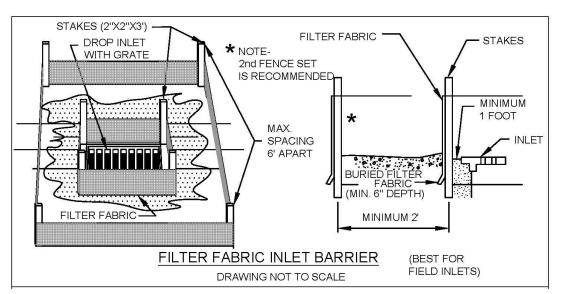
Schematic drawing for storm drain inlet protection (exterior protection)
